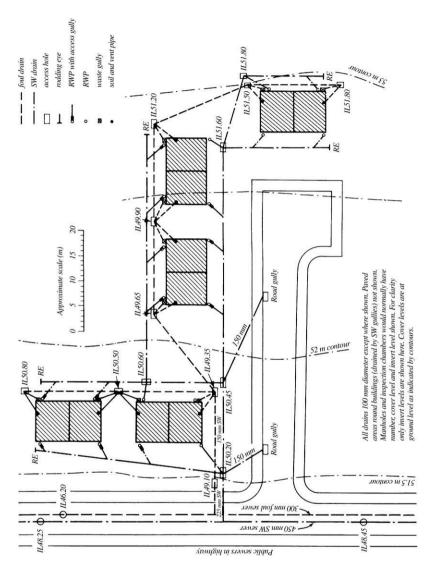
Below-ground drainage: read this layout in conjunction with Figure 11.4.
